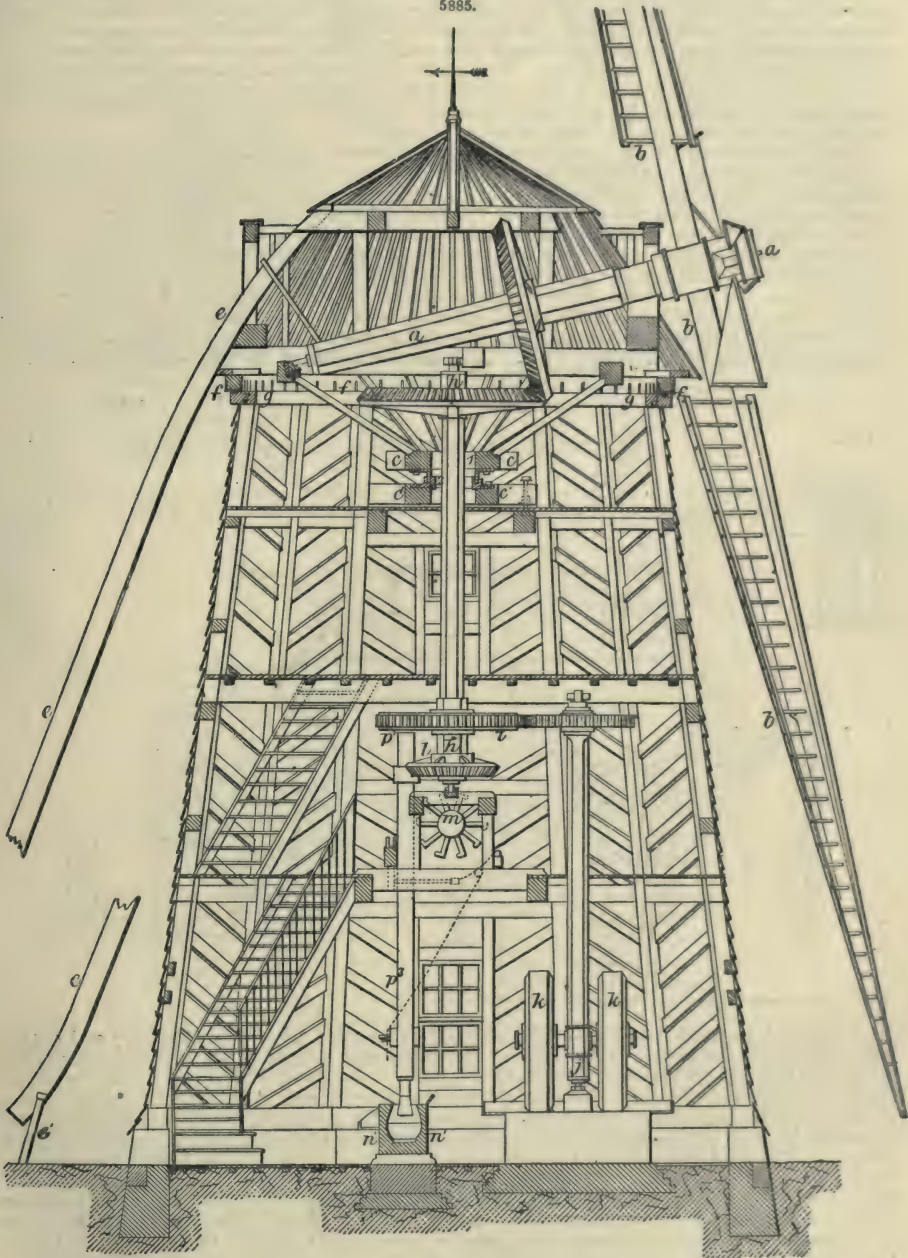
is a vertical section of a windmill arranged to drive the gears of a rape-oil mill. *a a* is the mill-shaft; *b, b*, the sails; *c c*, movable support for the mill-shaft; *e e*, hand-lever for shifting the movable mill-cap; *f, f*, bearings of the cap; *g g*, summit of mill-tower; *h h*, main shaft; *i*, toothed wheel and pinion turning the shaft *j* of the stones *k, k*; *l*, bevel-gears for driving such other machines as the stamp battery, or press, seen at *p², n'*.
